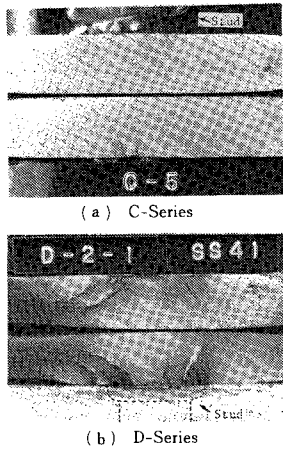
Typical Fracture Surface of Coupon Specimens.
